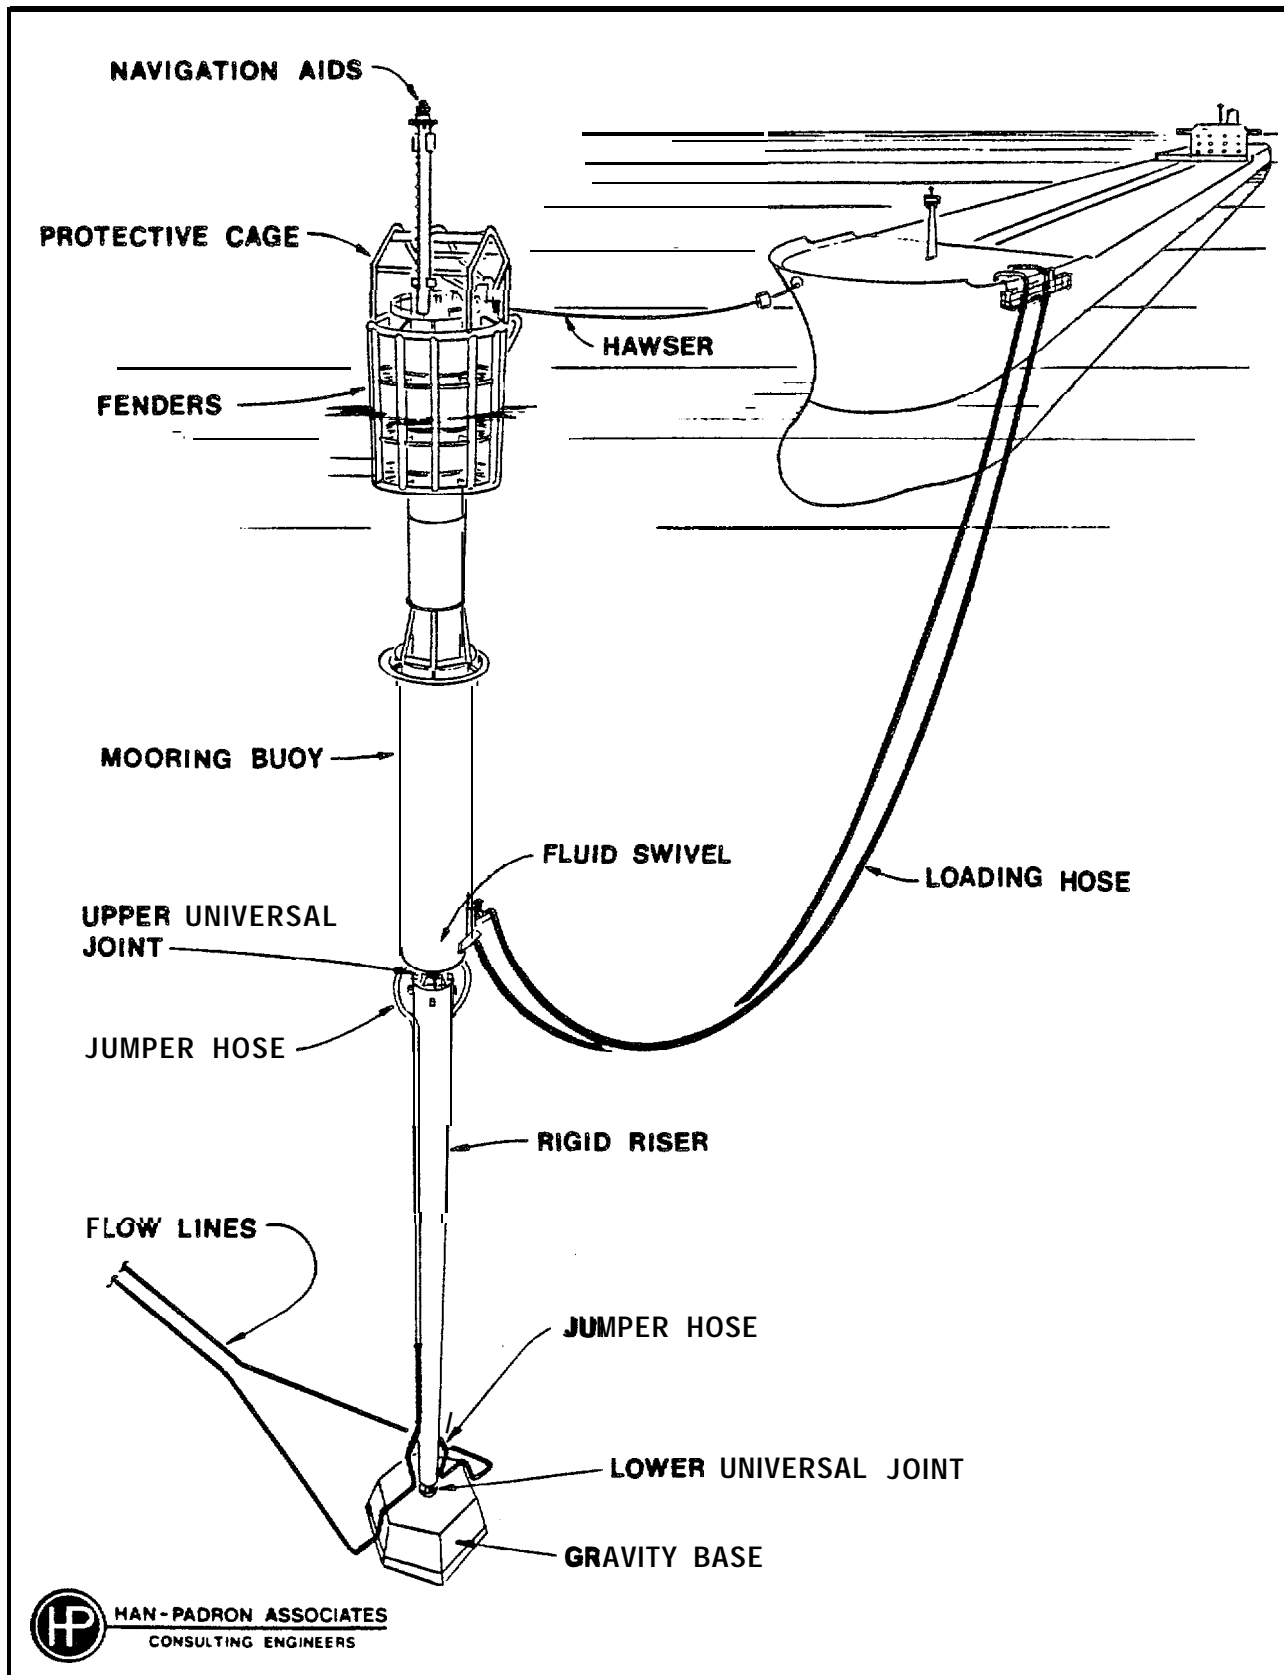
Thistle Field single anchor leg mooring (SALM).
